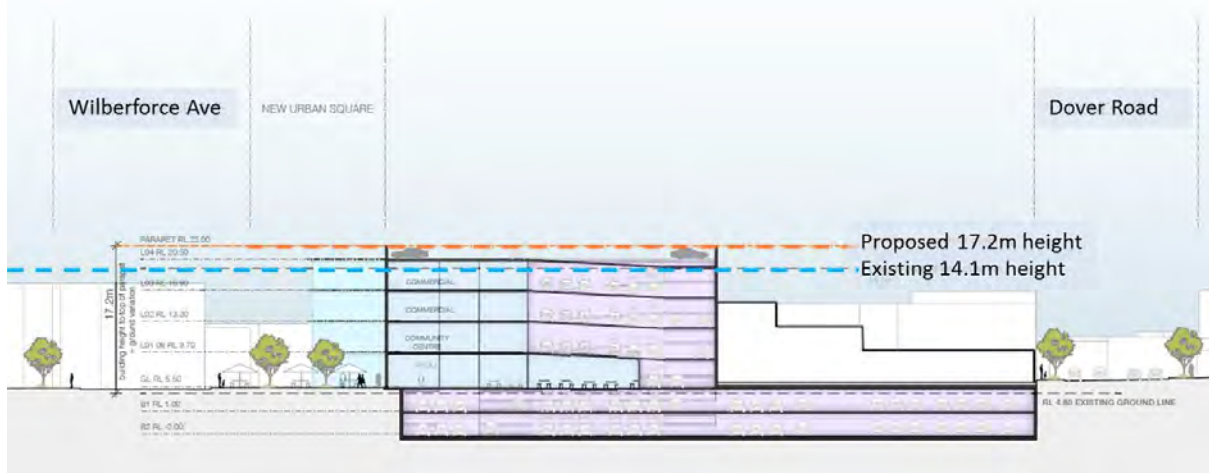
Section of maximum building heights between Wilberforce Avenue and Dover Road
